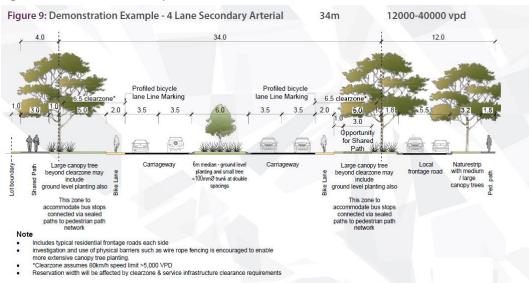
4-Lane Secondary Arterial Cross Section
